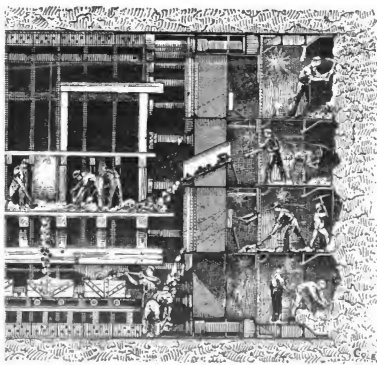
SECTIONAL VIEW OF HYDRAULIC SHIELD.
